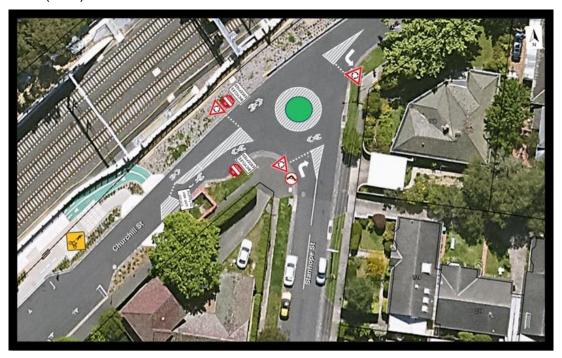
Possible Traffic Treatment at Churchill Street and Stanhope Street intersection
